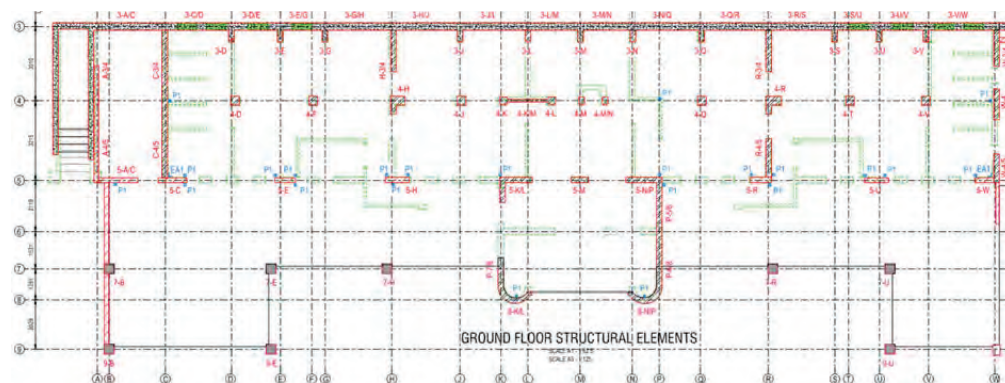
Internal original walls removed shown green, remaining walls black/red.
